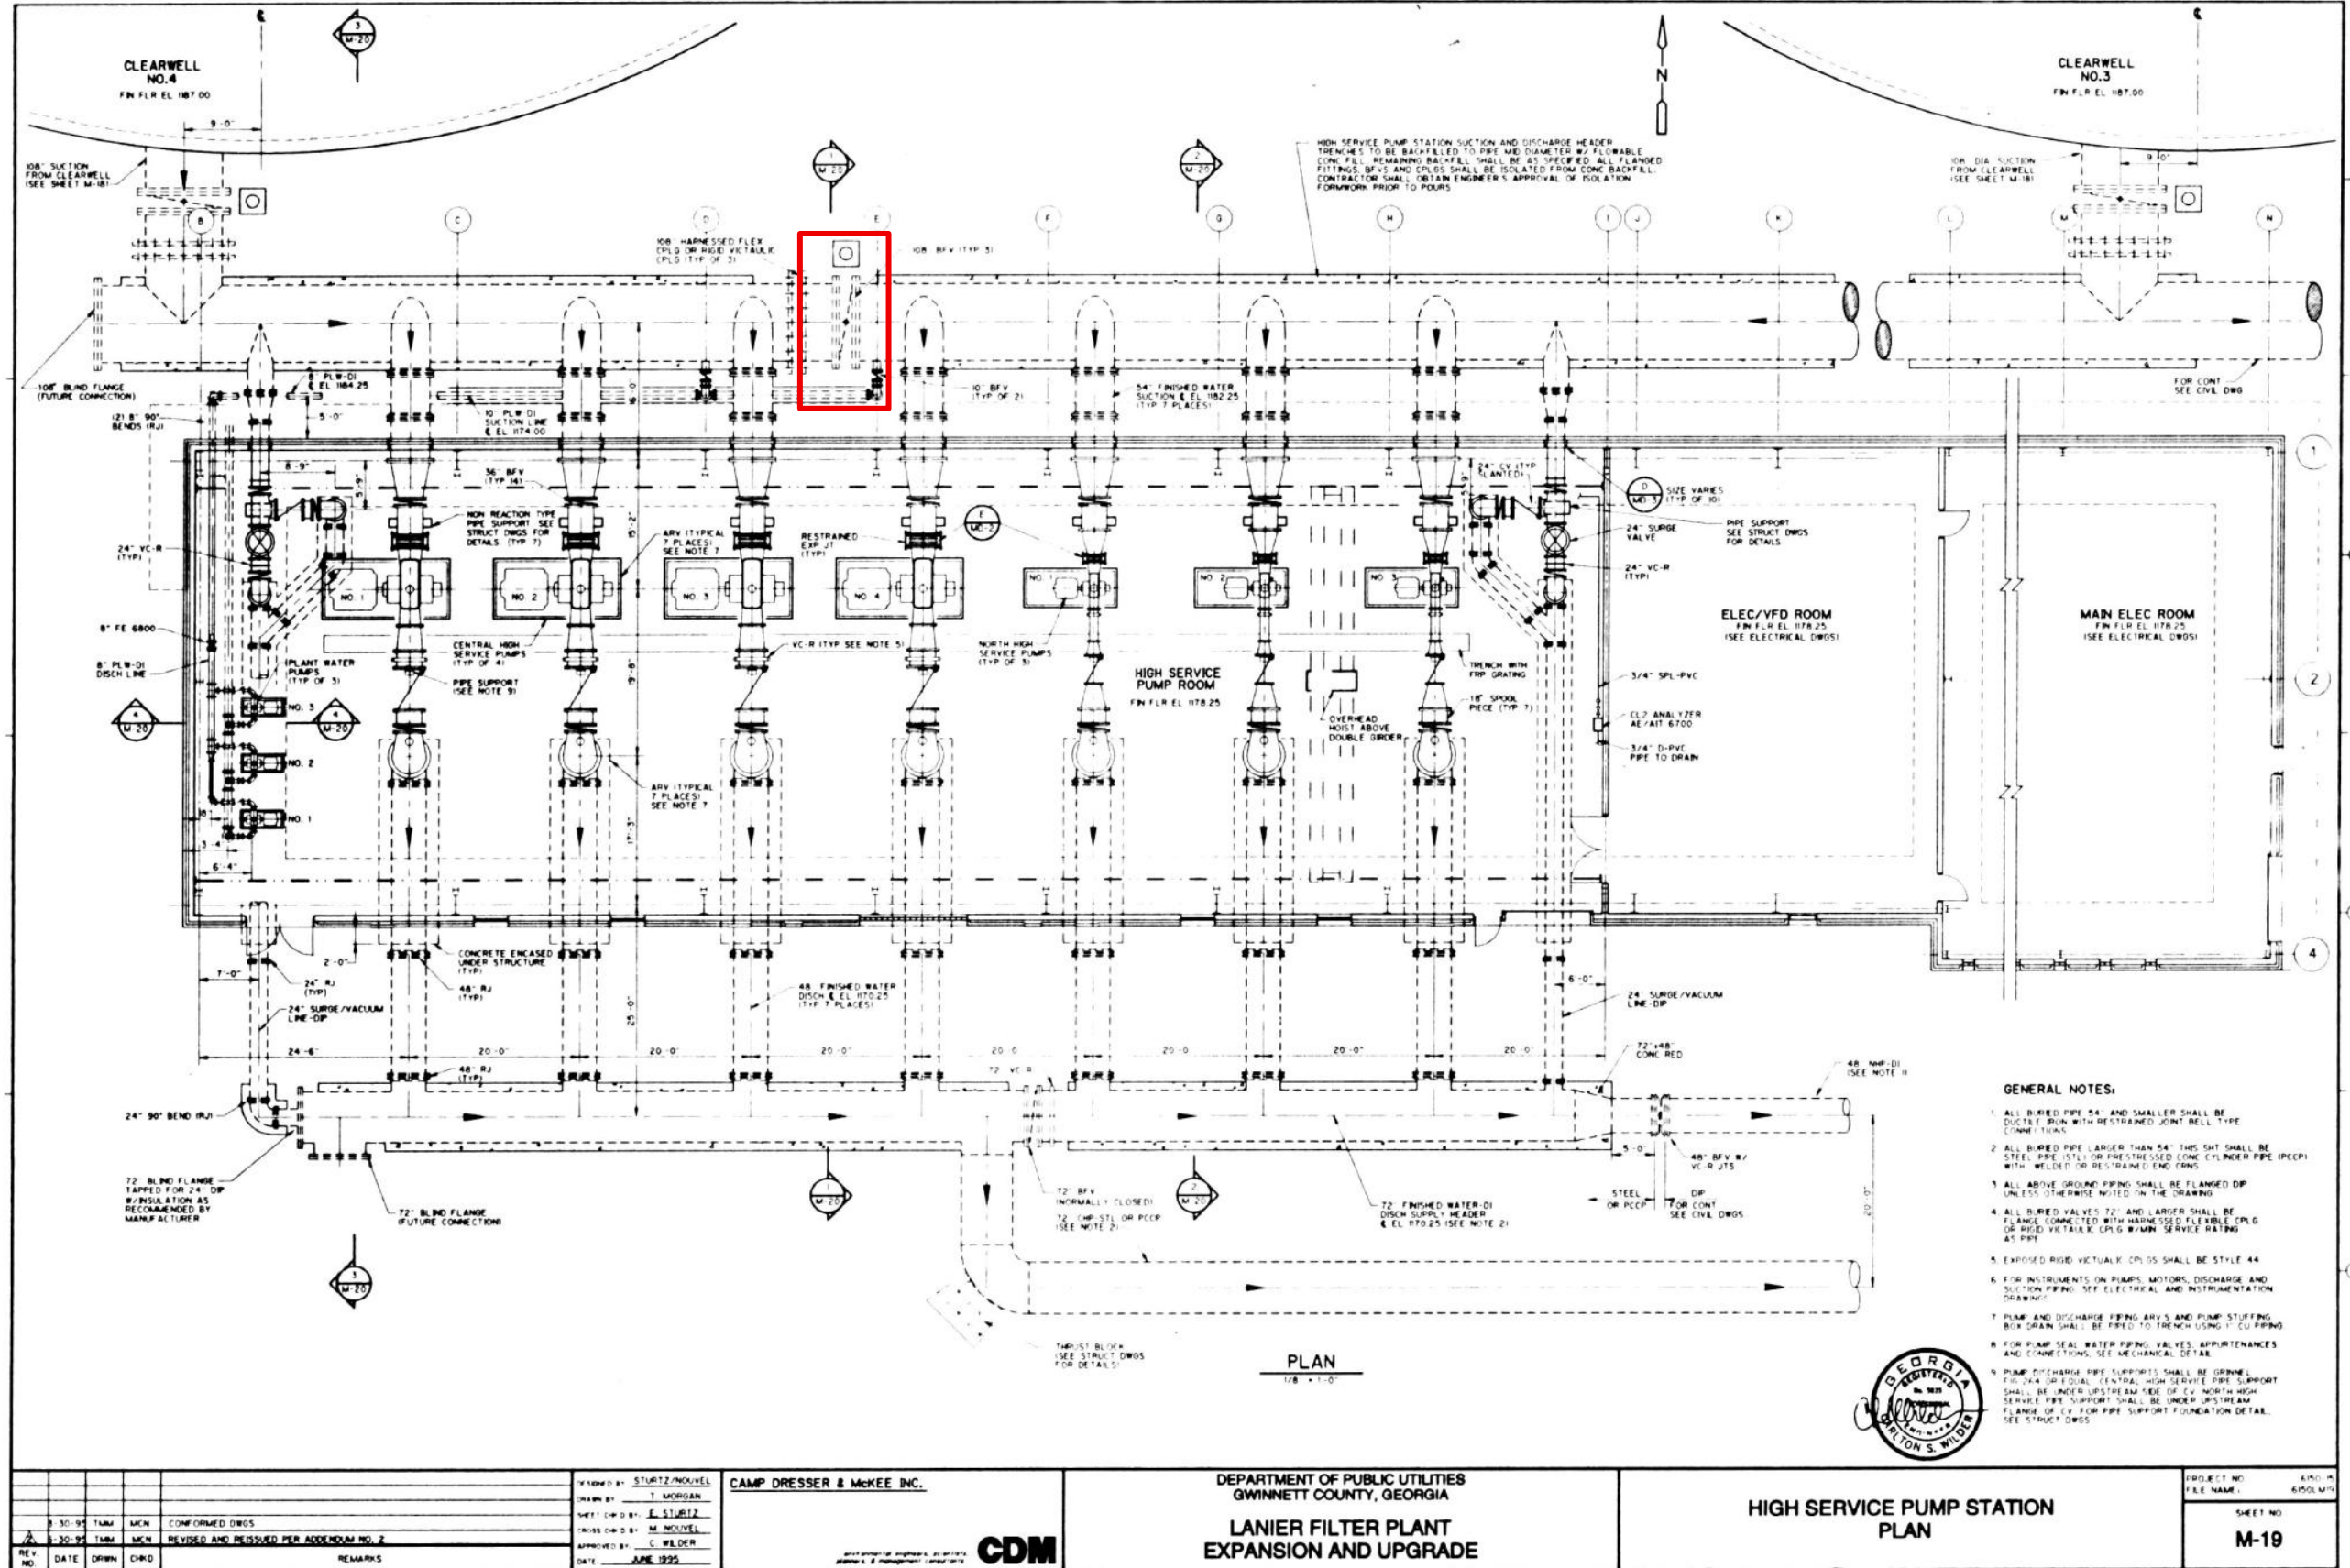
(LFP) Clearwell No. 3 and No. 4 Site Layout
